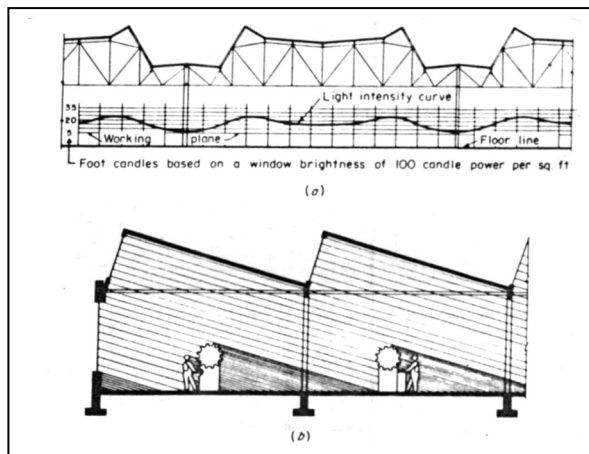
Good natural lighting relates to both window and roof design. a. Window in a monitor roof provides good uniformity and intensity. b. The windows in a saw tooth roof cast shadows that block working area. Source: Chiara and Callender, 1990.
